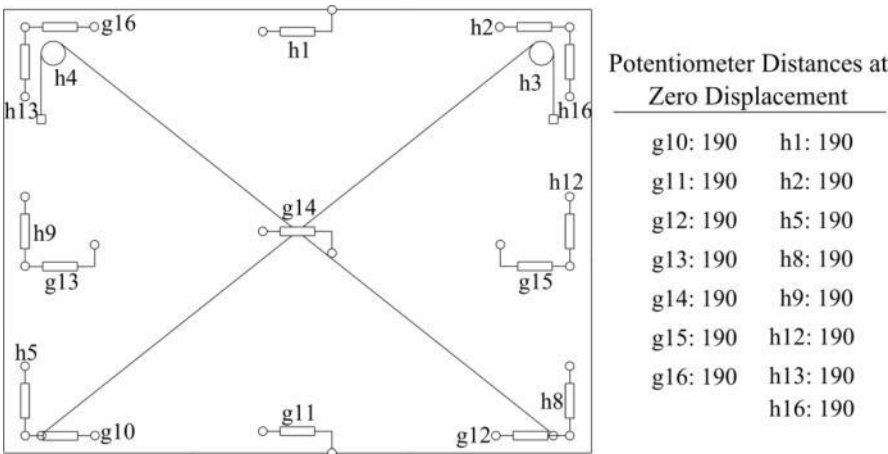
Instrumentation of the as built unreinforced clay brick infill wall specimen FIF3-UCBI
